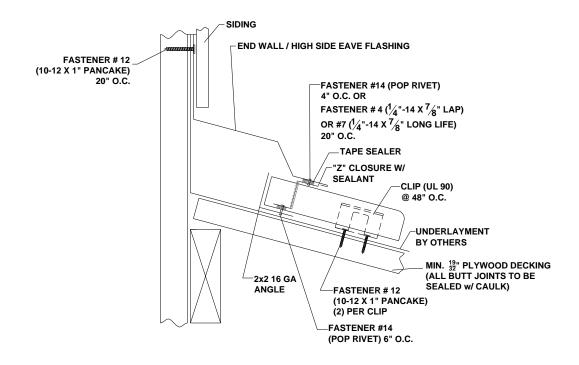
Fixed Endwall/Parapet High Side Eave Detail
